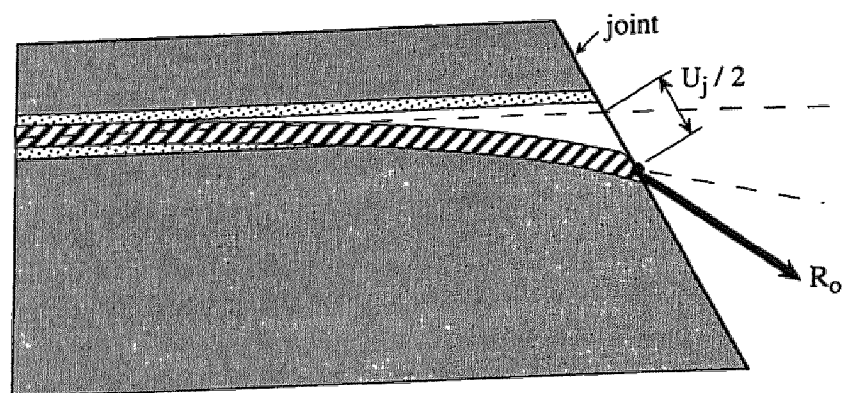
Deformation and loading conditions of a grouted bolt
